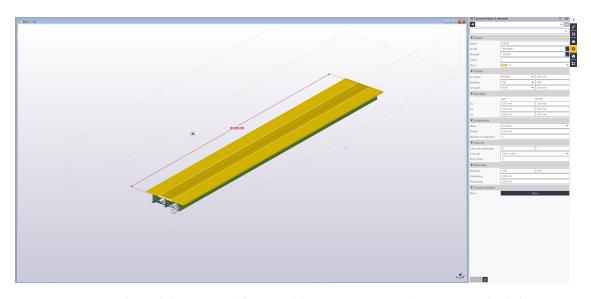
Final model exported from Tekla Structures with concrete deck (concrete beams)
